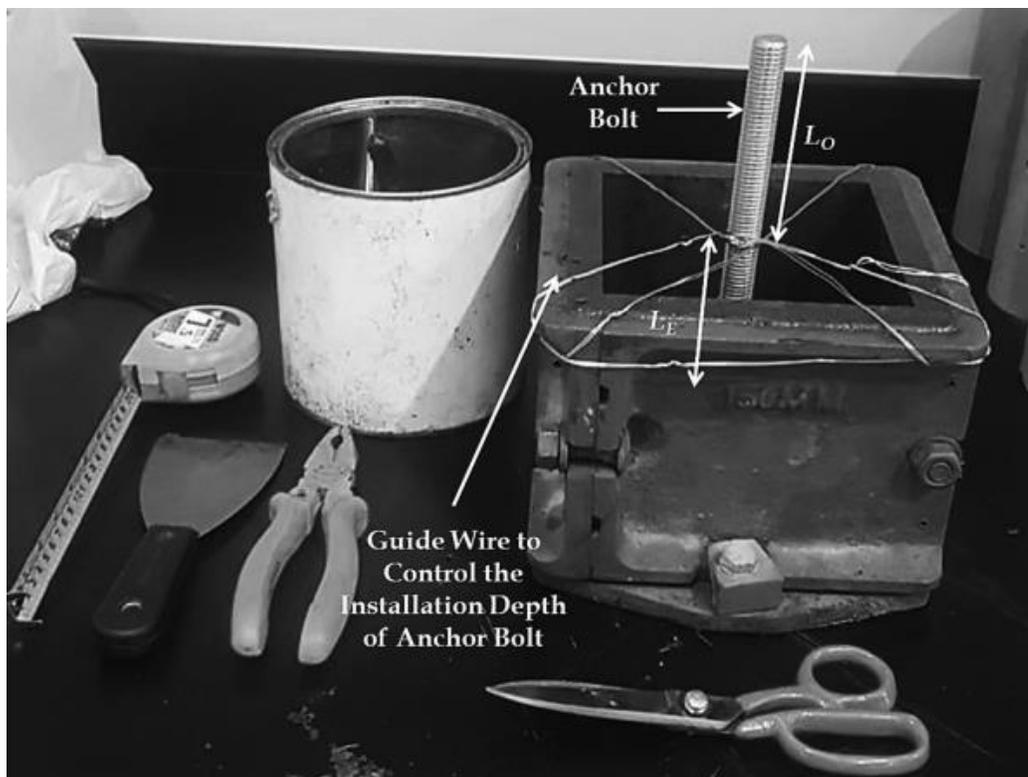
A view of the guide wire mechanism for steel Anchor bolt installation [5].
